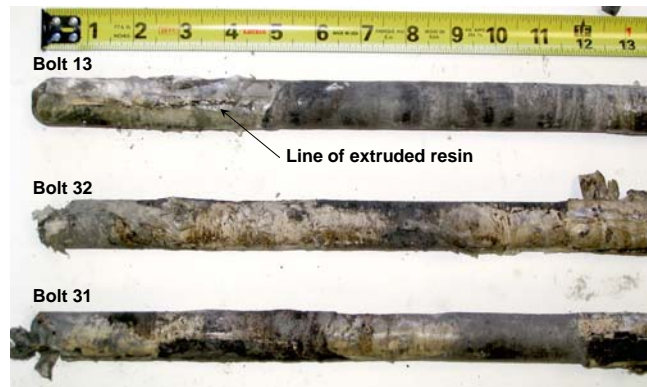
Bolting horizons of bolts 13, 32 and 31, showing typical good resin mixing and partial glove fingering. Bolt 13 shows a line of resin extruded into the coal. Bolts 13 and 32 are offset head bolts. Bolt 31 is a standard bolt. Bolt tops at left.
